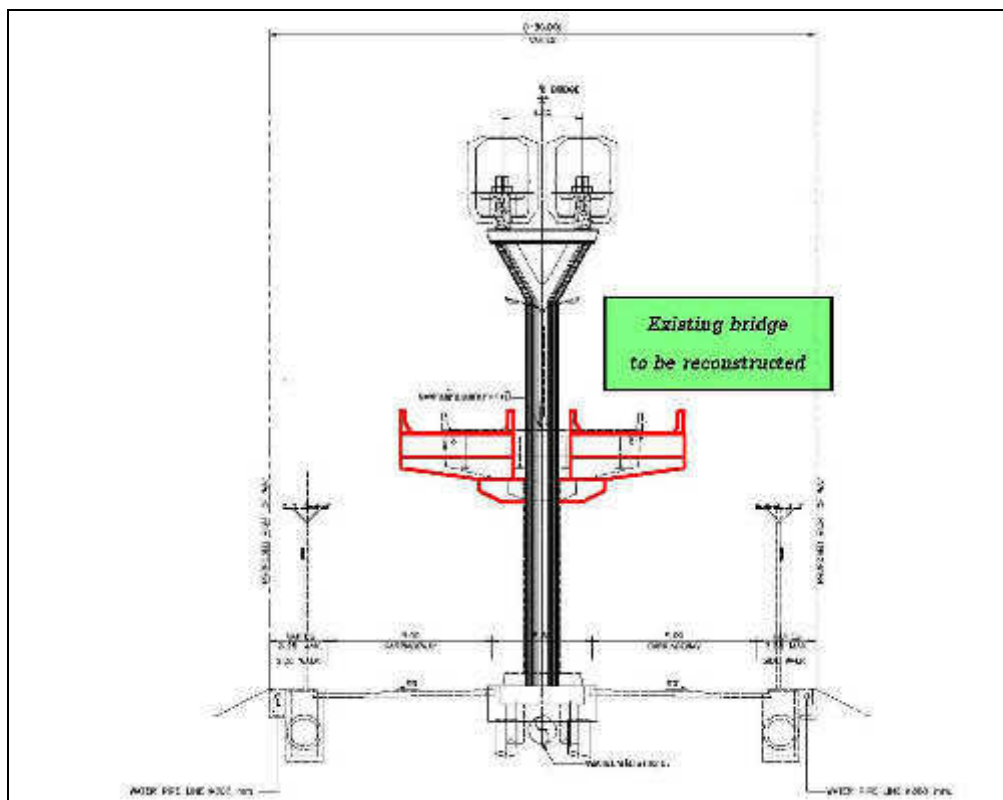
4 Cross section of project at Bang Kapi Junction, 4<sup>th</sup> Alternative
